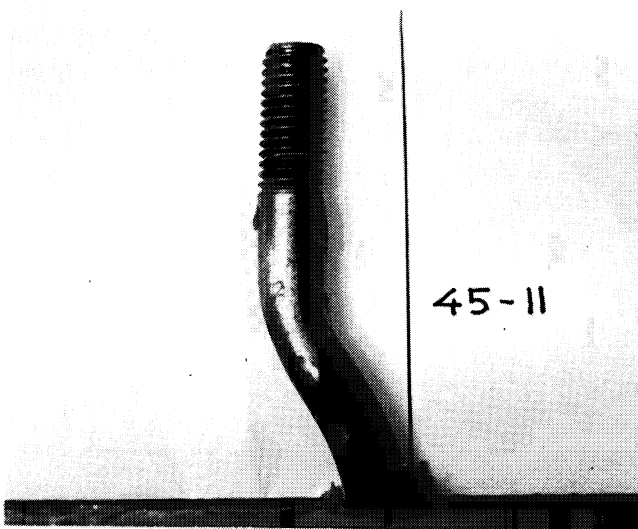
Anchor bolt failure; load applied at 45°
